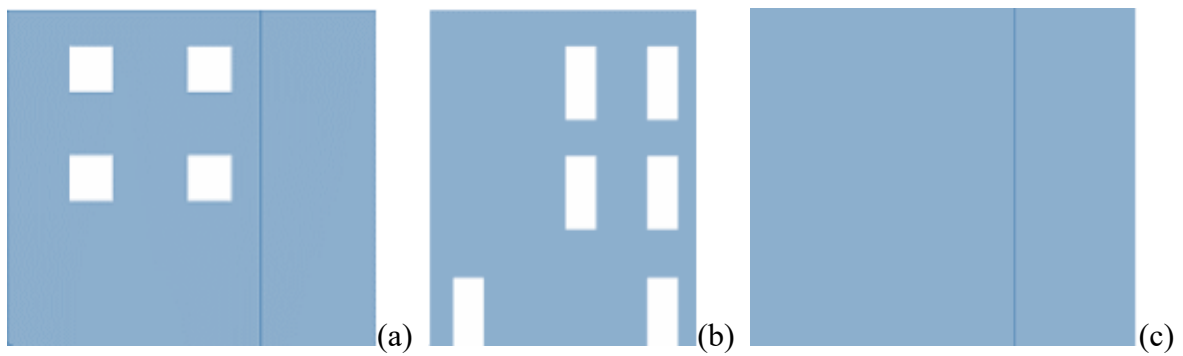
a) External walls; b) internal walls; c) U1-U2 and U2-U3 shared walls.
